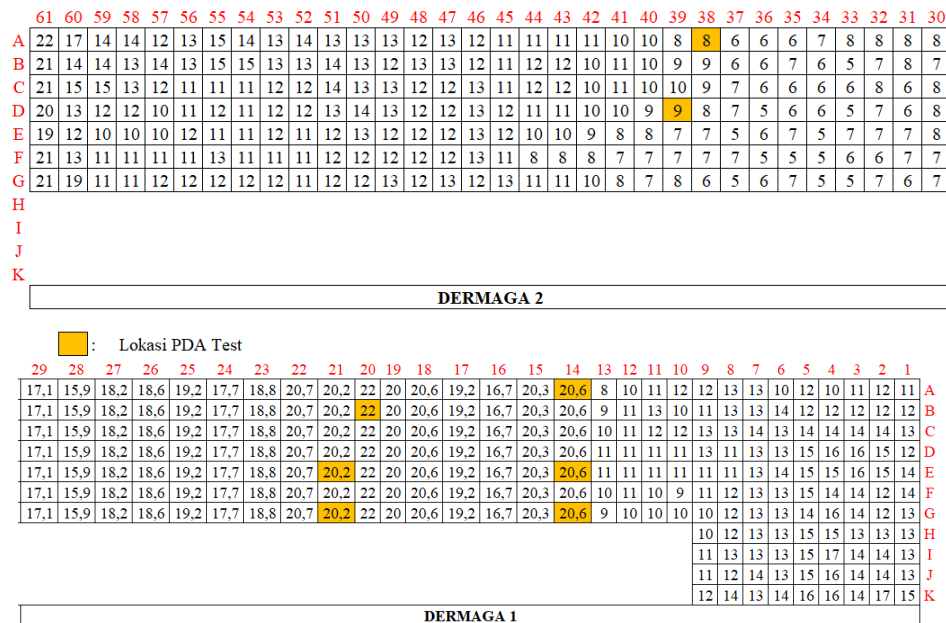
PDA Test Location Plan at Pier 1 and Pier 2
